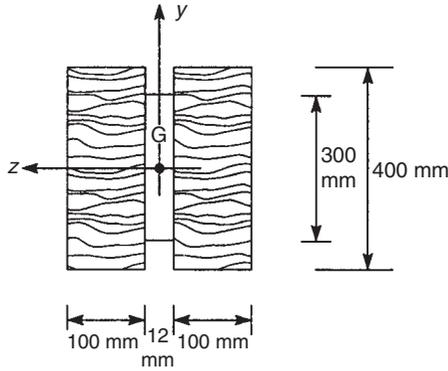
Steel-reinforced timber beam of Ex. 12.1
